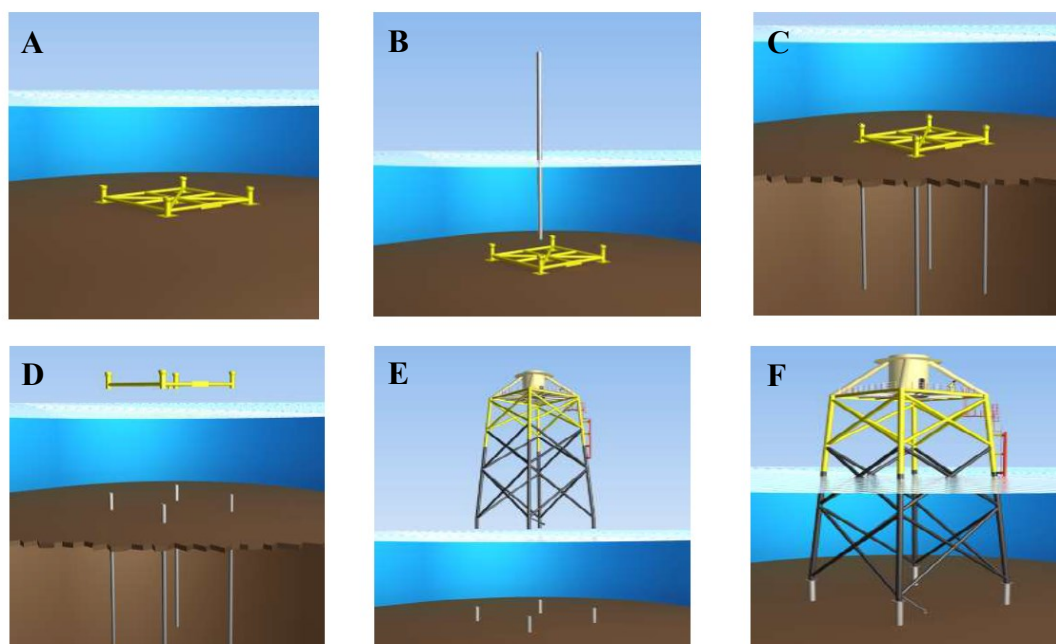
Illustration of the template pre-piling method for the installation of jacket foundations.
